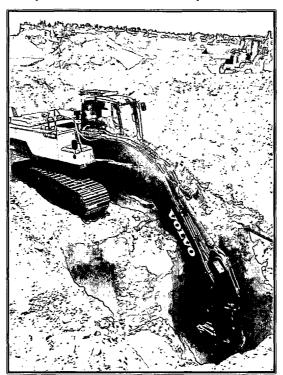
Excavation approximately 20' below the Lateral C-7 Pipeline.
